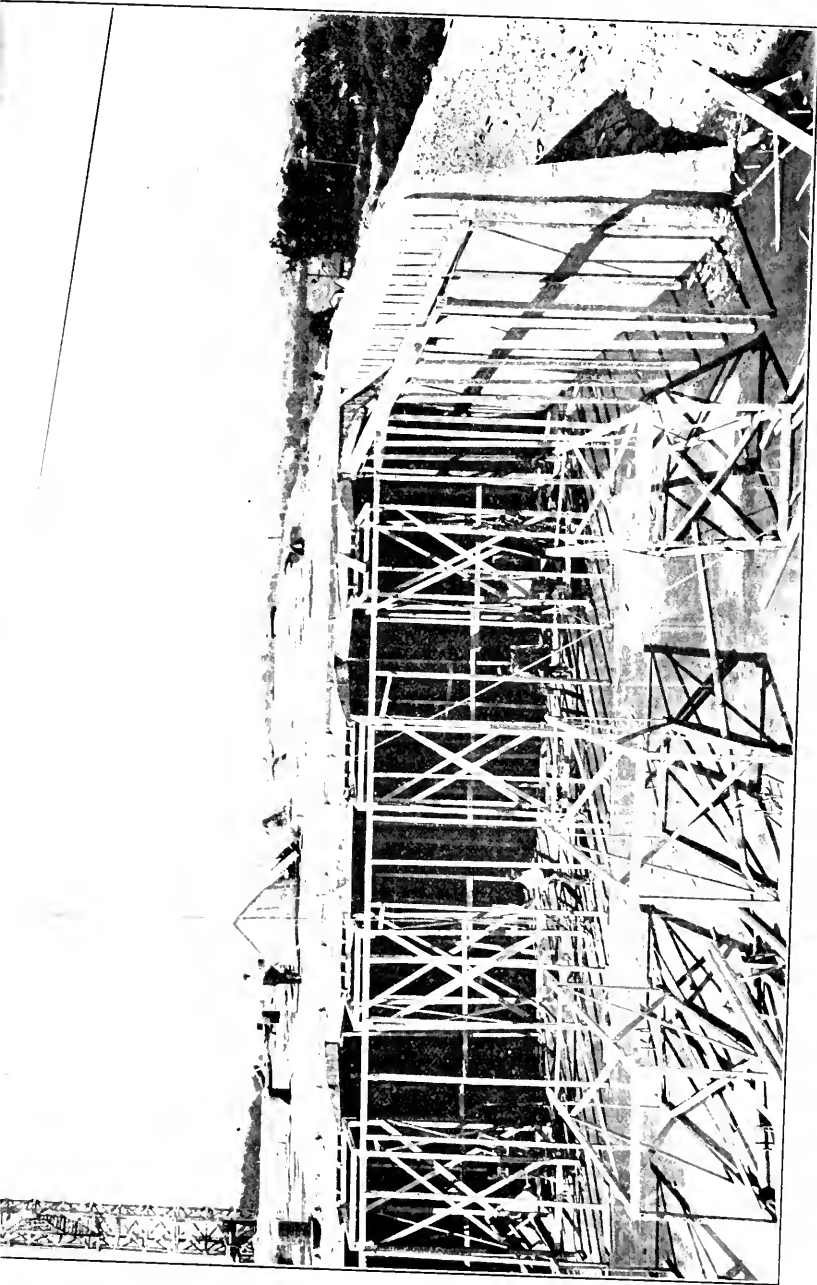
WABAN HILL COVERED RESERVOIR. June 28, 1917. Roof 60% completed on Section 4.
